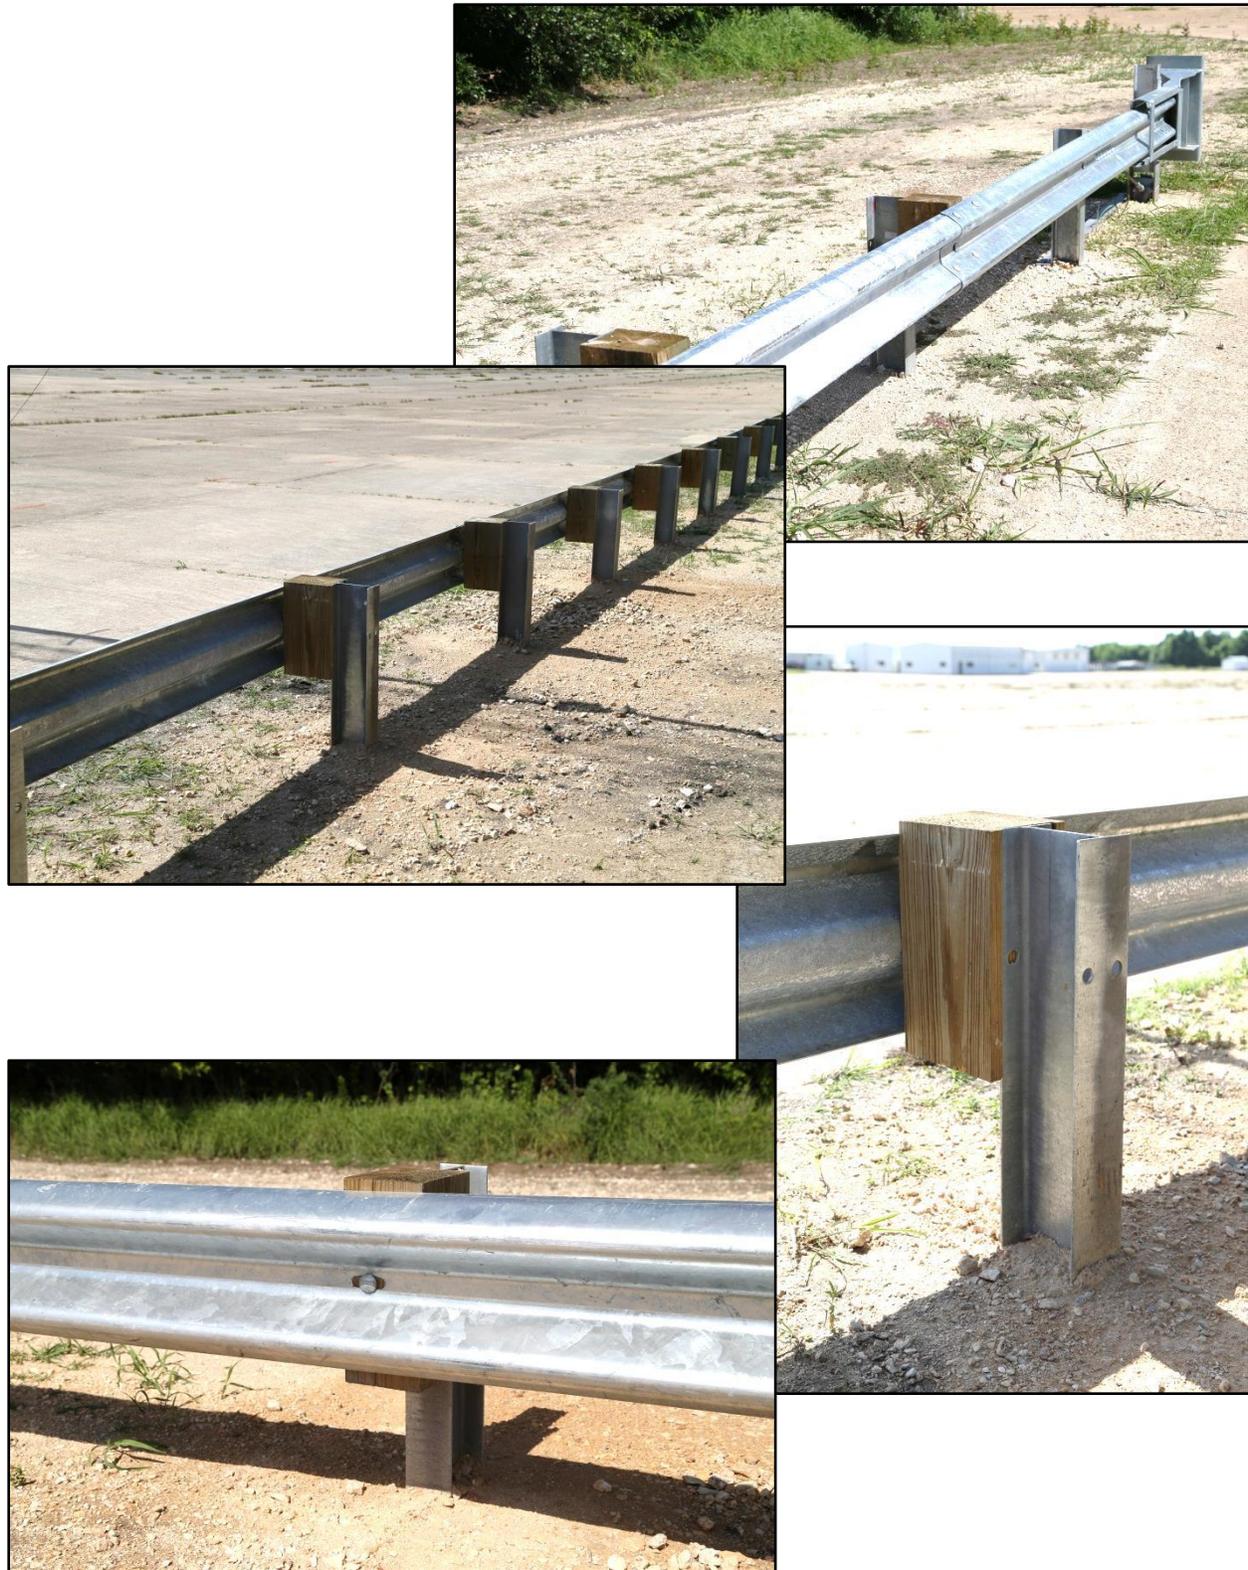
24-inch Tall Strong-post W-beam Guardrail prior to Testing.
